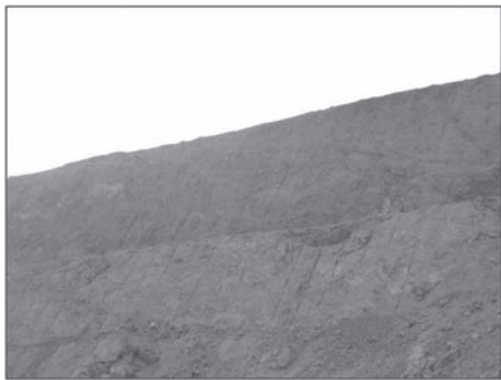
Presplit results showing half barrels on foot-wall of the pit.
